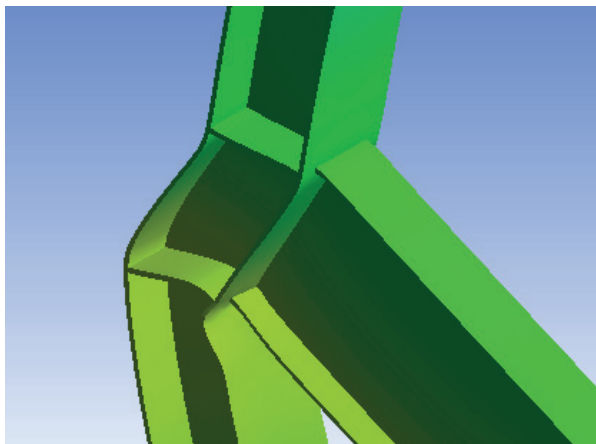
Local instability of the column web at the lower beam flanges as a fire-induced damage pattern for joint “A”
